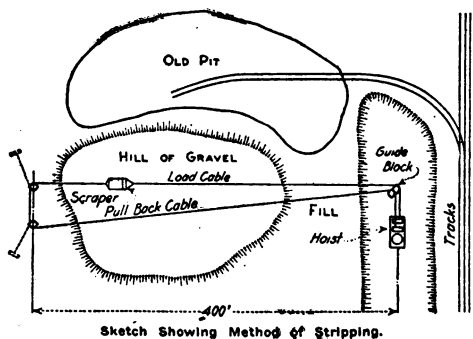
Layout of Plant for Stripping Overburden with Bottomless Bucket.
